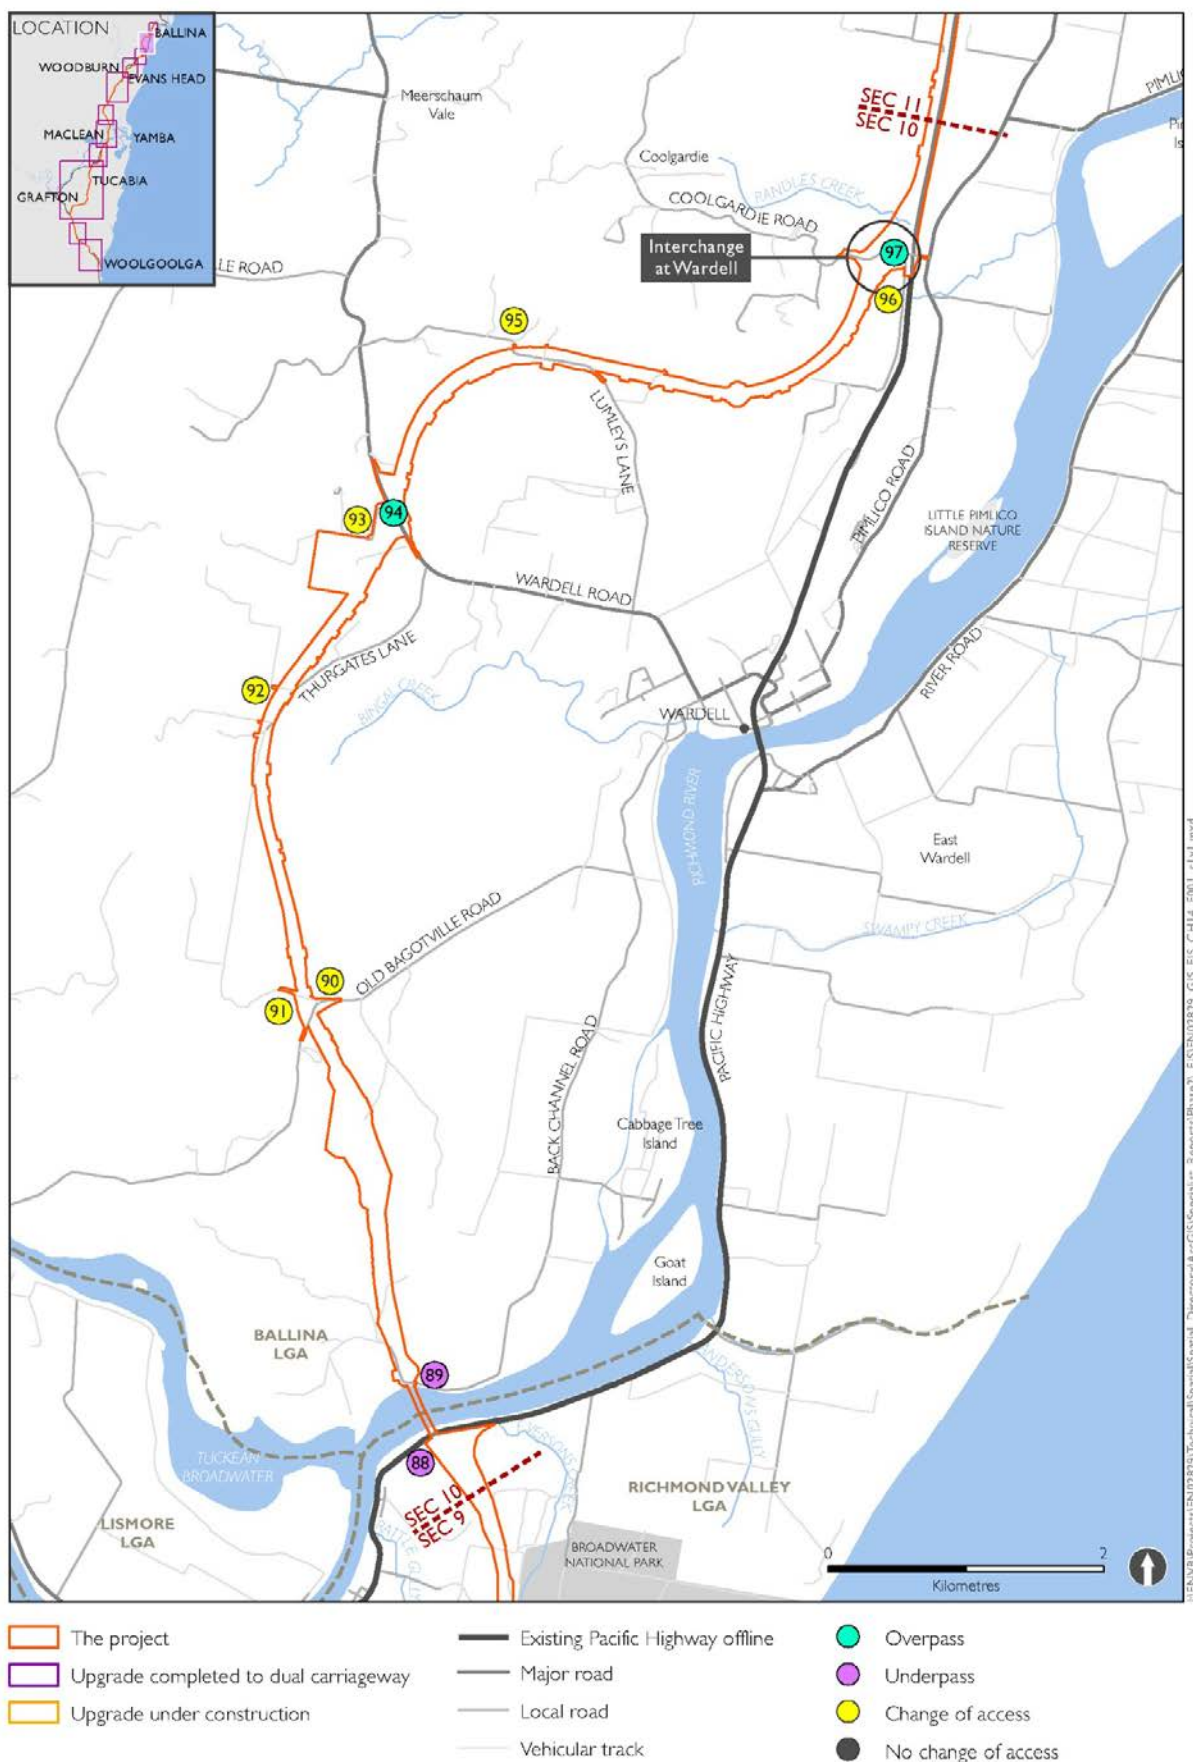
Locations of road alterations or changed access arrangements: Section 10
